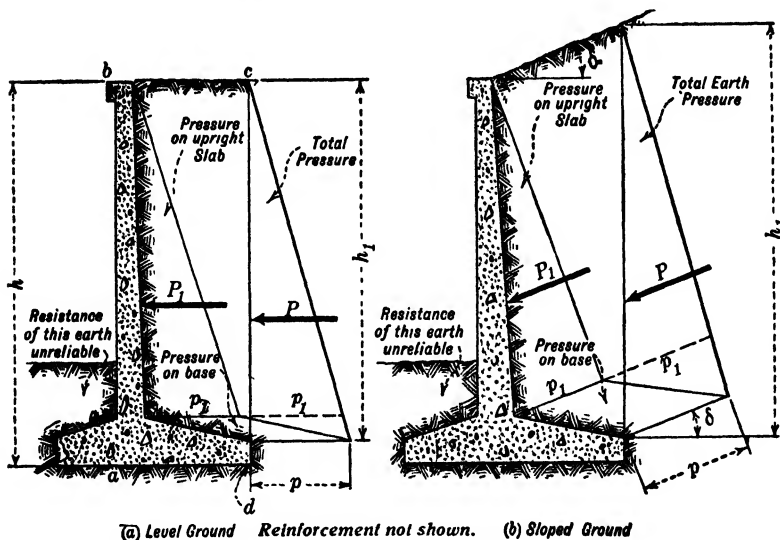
Earth Pressure on Reinforced Concrete Retaining Walls. (See p. 842.)
